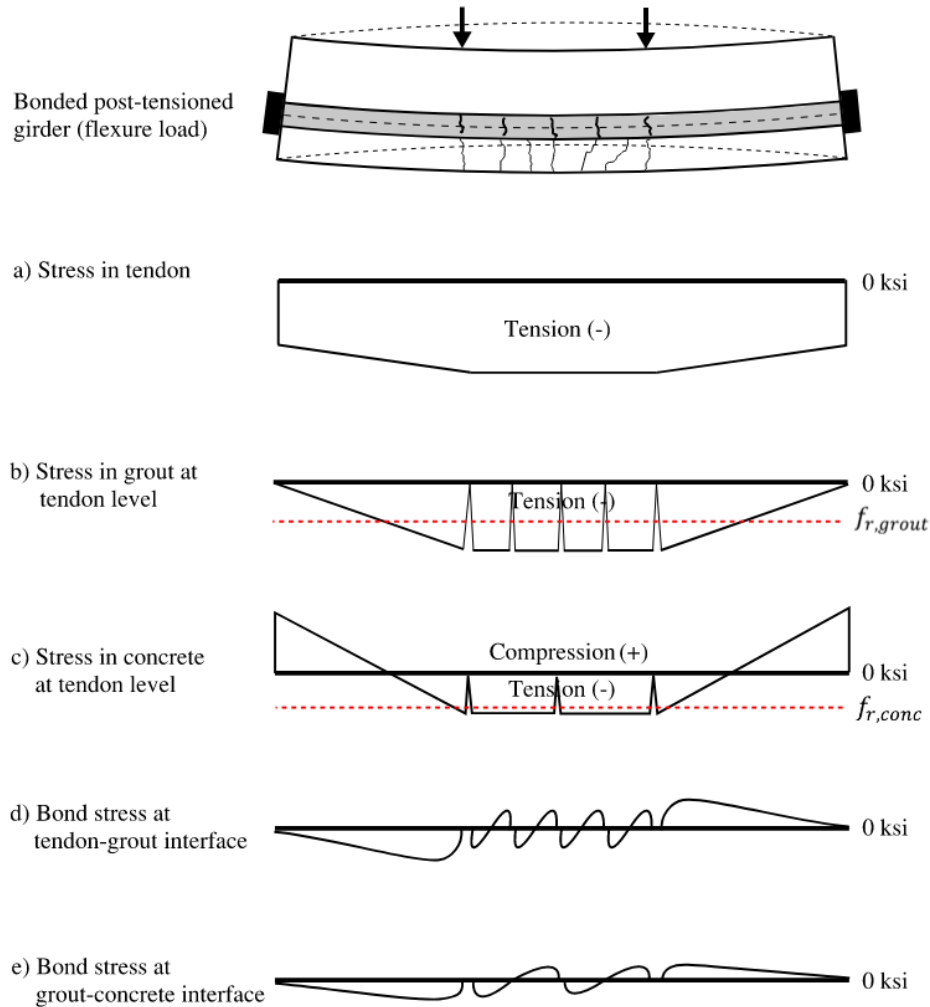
Bond stress distribution in grouted post-tensioned tendon subjected to flexural load (after tensile cracking of grout and tensile cracking of concrete).
